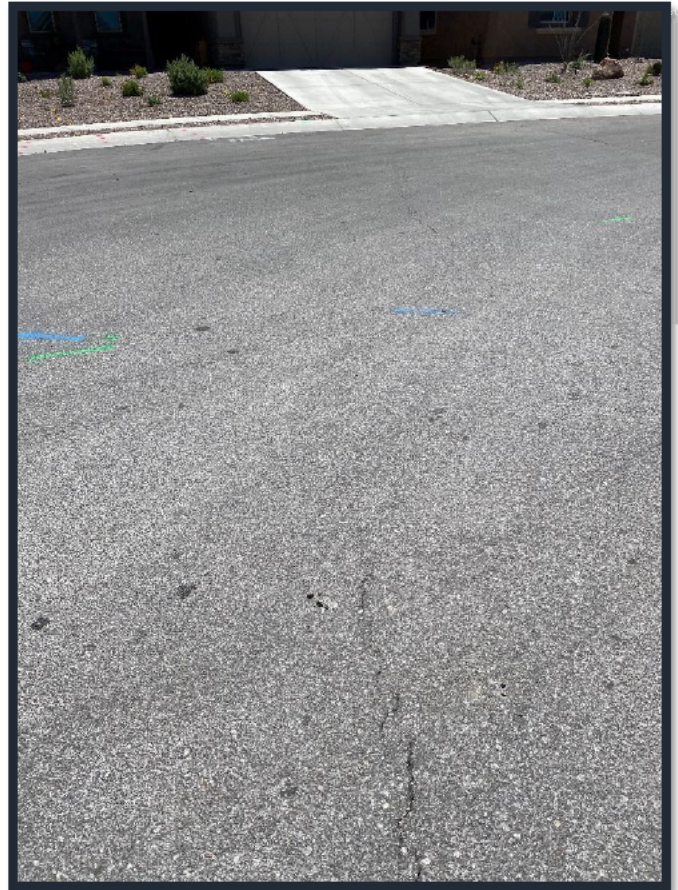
Cracks in the asphalt, looking southwest from middle of the road
